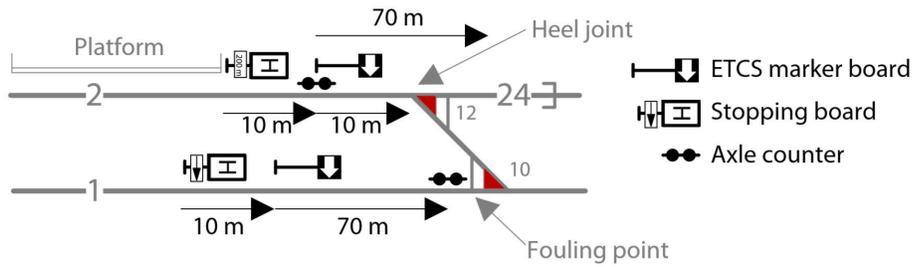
Detailed alignment of station elements around turnouts (objects only indicative)
